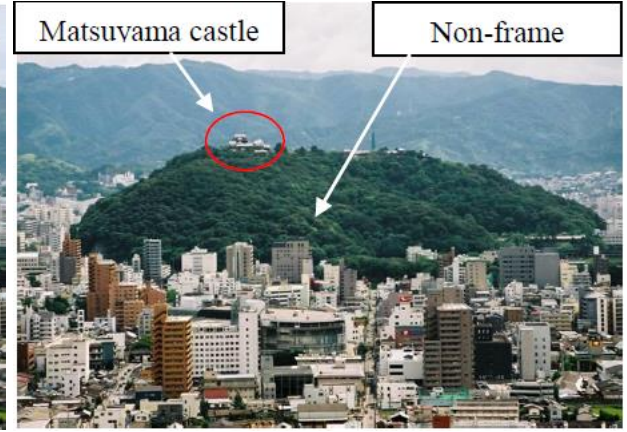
Matsuyama castle (1 year after Non-frame was constructed)
